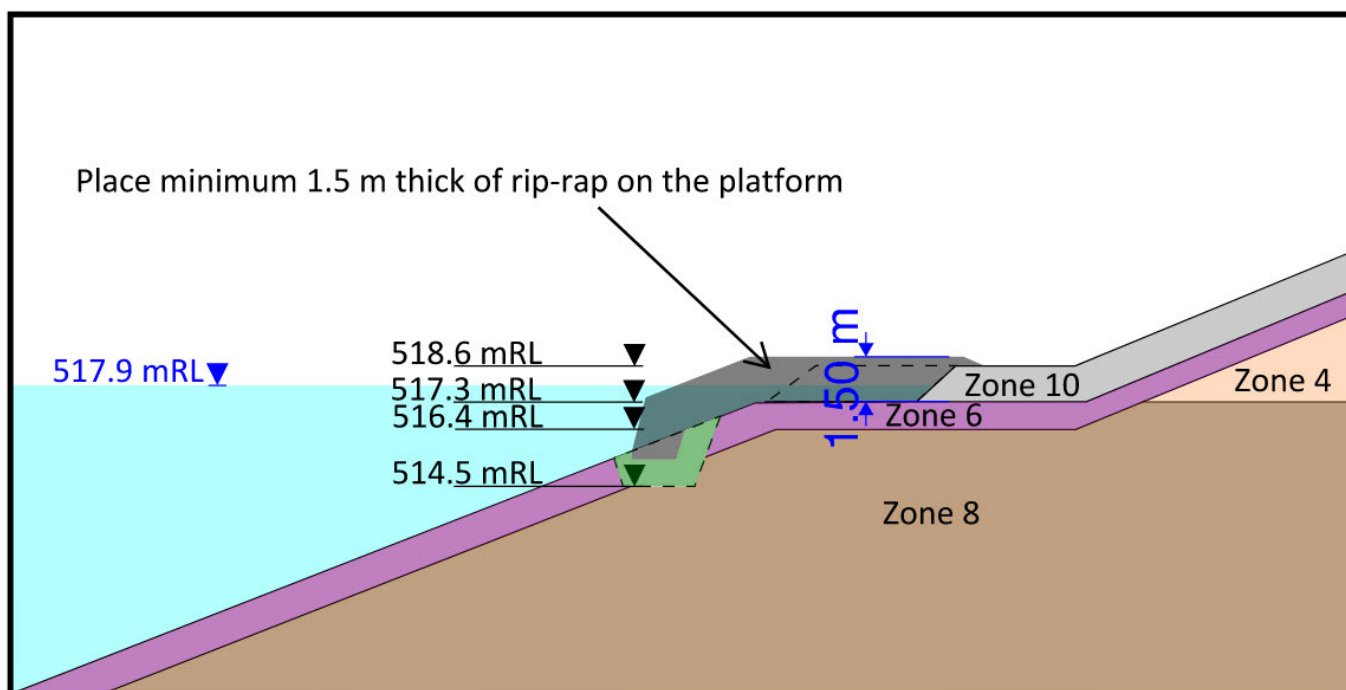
Schematic sketch – Tranche 1 – Main Dam – installation of rip-rap along upstream face and on the construction bench
